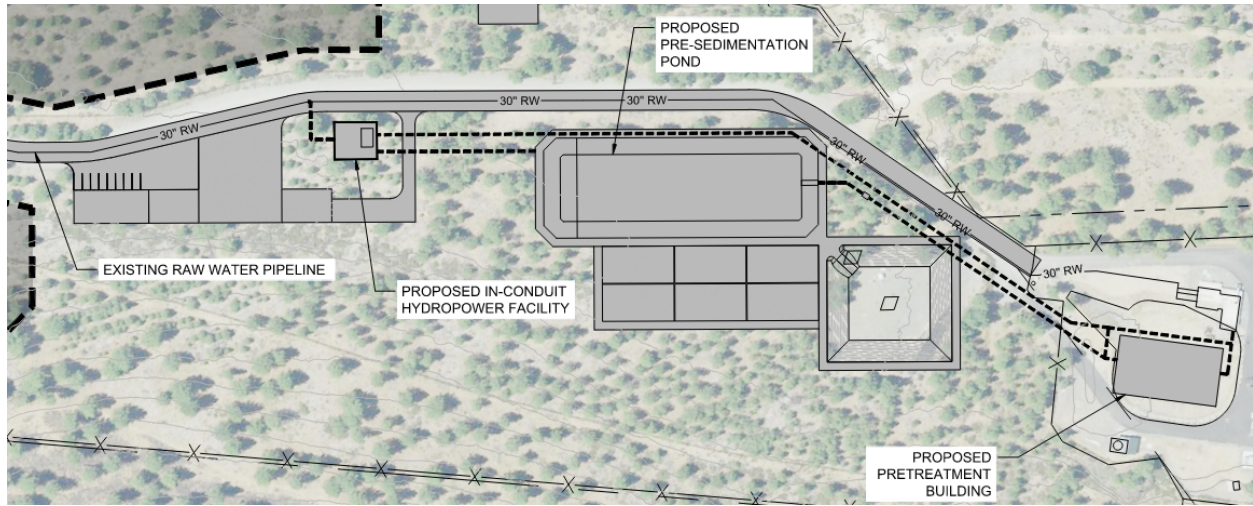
Site Layout of Proposed In-conduit Hydropower Facility
